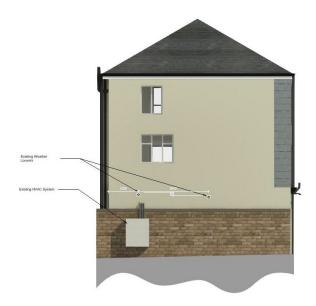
Existing North Elevations with existing air conditioning along an external wall and existing weather louvers
